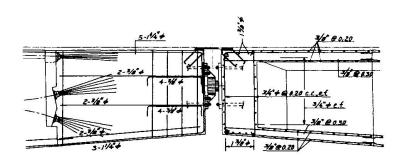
Typical cantilever joint - prestressing and reinforcement.
